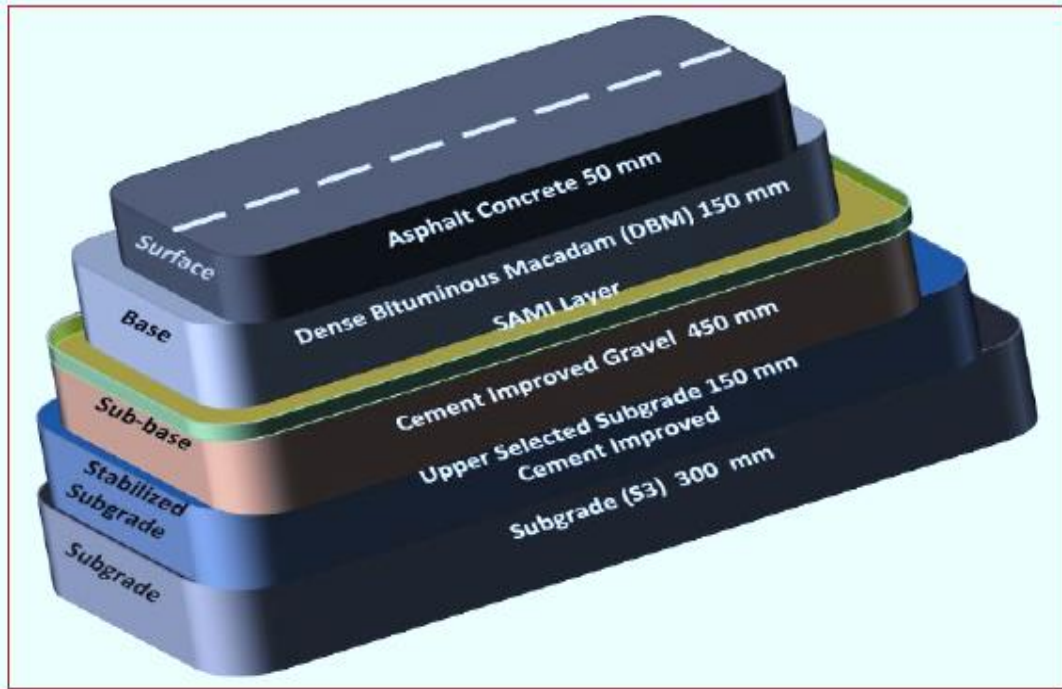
A thick pavement structure recommended for construction on Lamu-Garissa Road. (Source: Sai Consulting Engineers Pvt., 2015)
